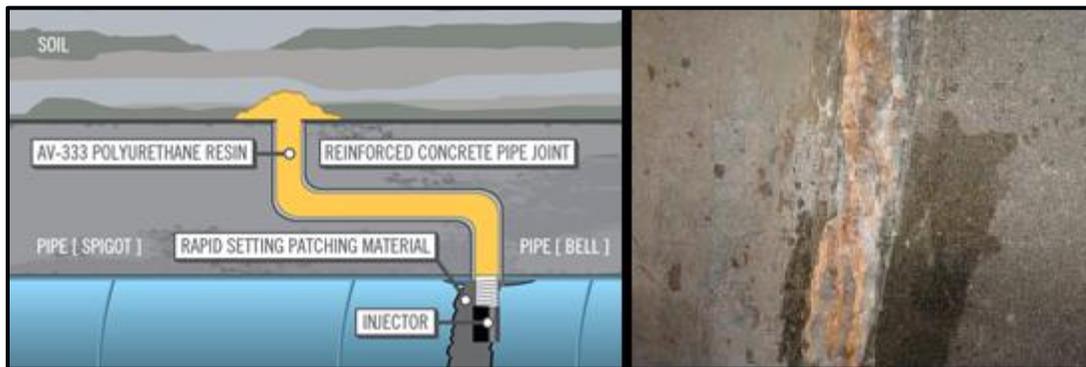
Pipe Joint Crack Repair Diagrams (left) (Avanti International, 2009) and Post-Joint Repair (right) (Prime Practices, 2010)
